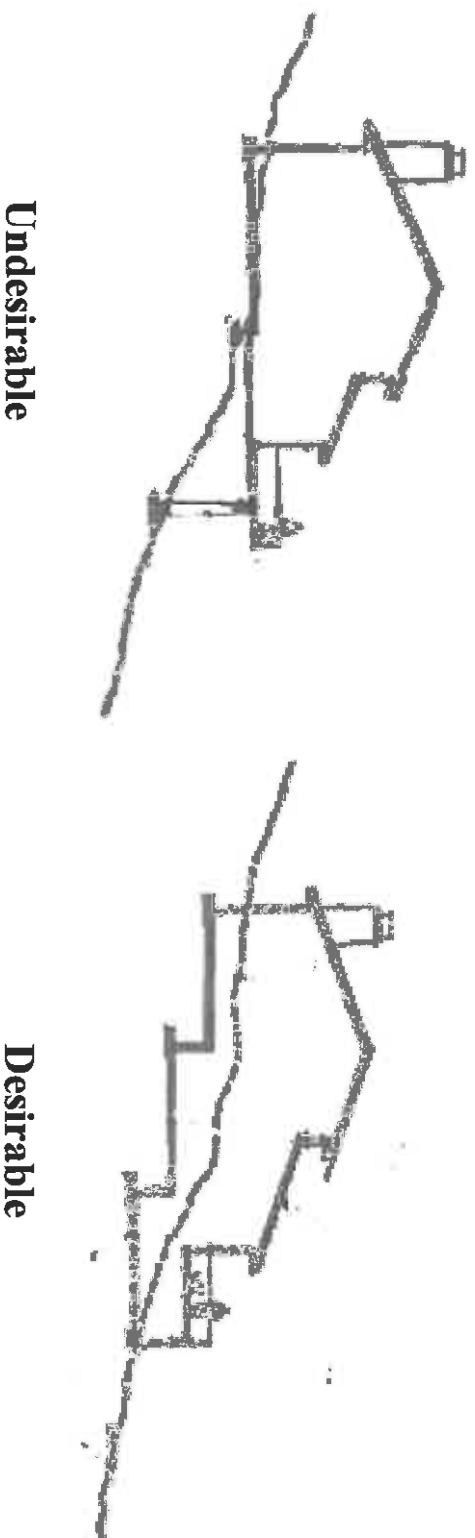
The desirable design mitigates bulk by stepping down with the slope and breaking long continuous roof and building walls into smaller elements.
